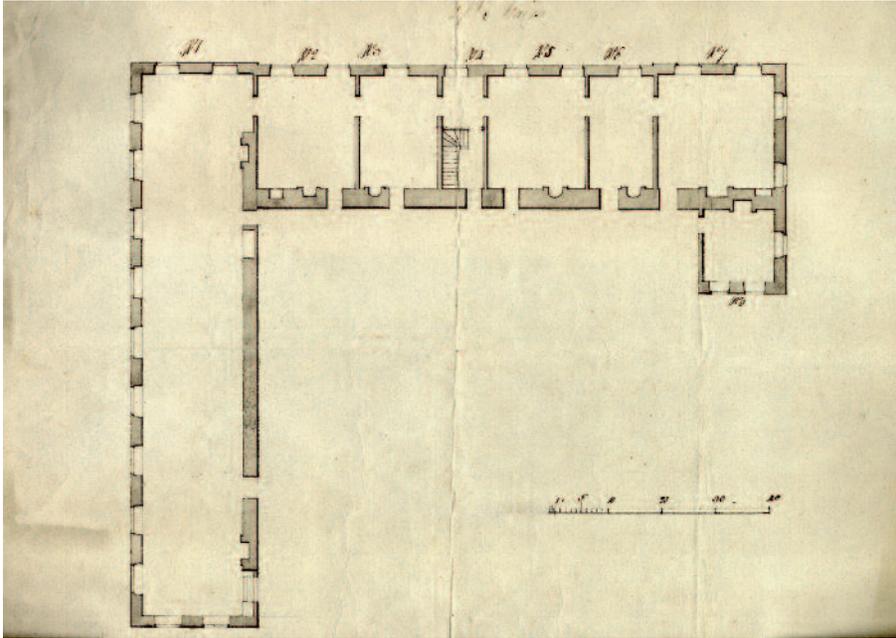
James Paine (here attrib.), plan of second floor of east wing of Weston Park, c.1761.
